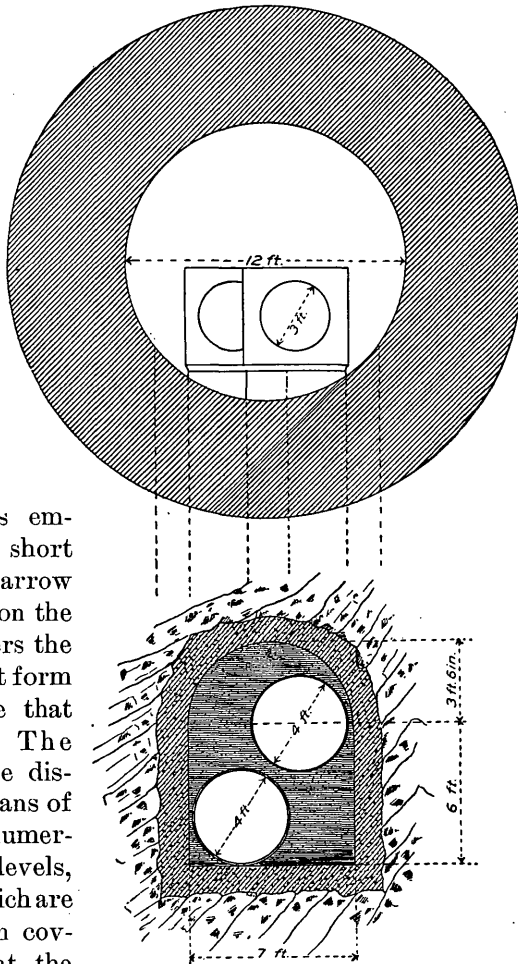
Cross sections of tower and outlet tunnel of Buttes dam.
